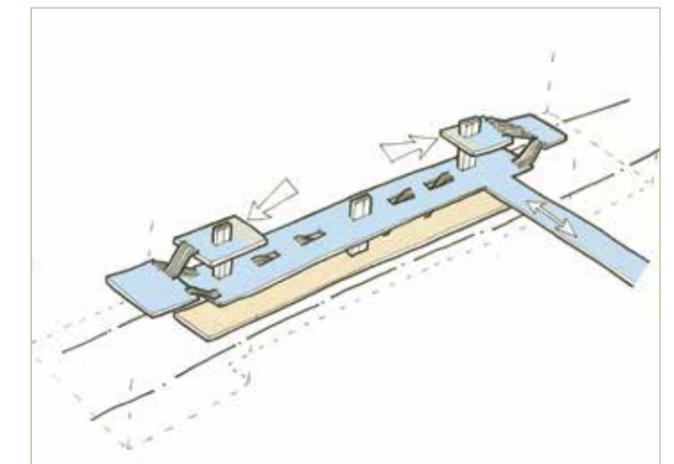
The study team's proposal envisages Flagstaff Gardens station to have platforms located deep underground, with entrances at either side. Both entrances would likely require both lifts and escalators.
